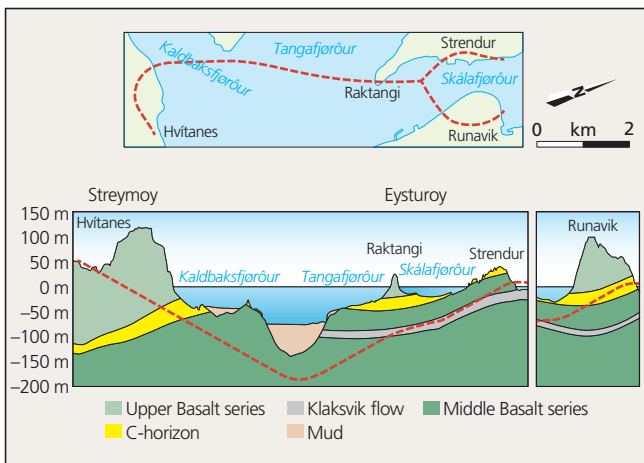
Plan and longitudinal section of Eysturoy tunnel (Jardfeingi)
